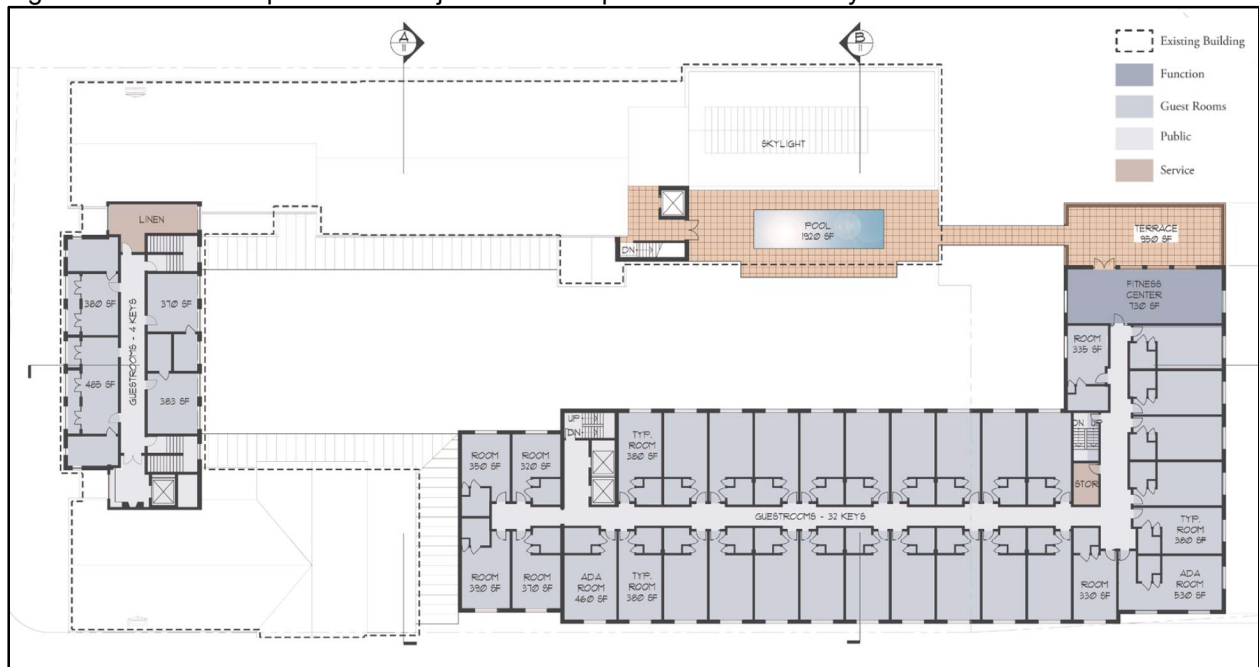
YWCA/Kimpton Hotel Project EIR – Proposed Second Floor Layout
